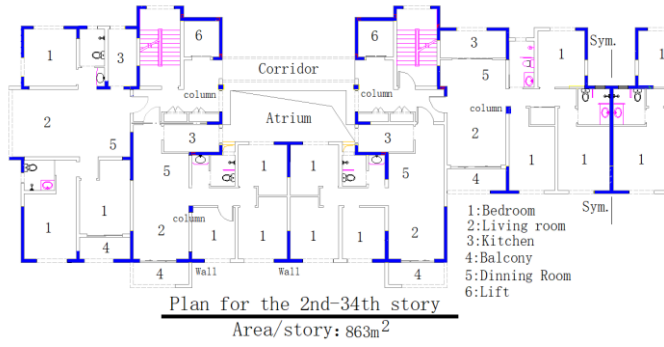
Plan layout of HX-CFT walls in a residential house in Baotou, Inner Mongolia
